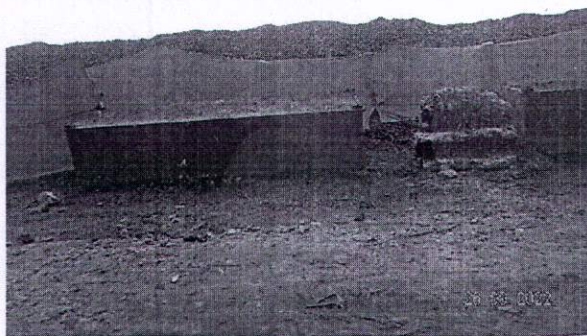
& 12: Photos of fabric sheets and metal sheets used in place of broken wall in the north east direction of project. Coal dumps can be seen inside.
